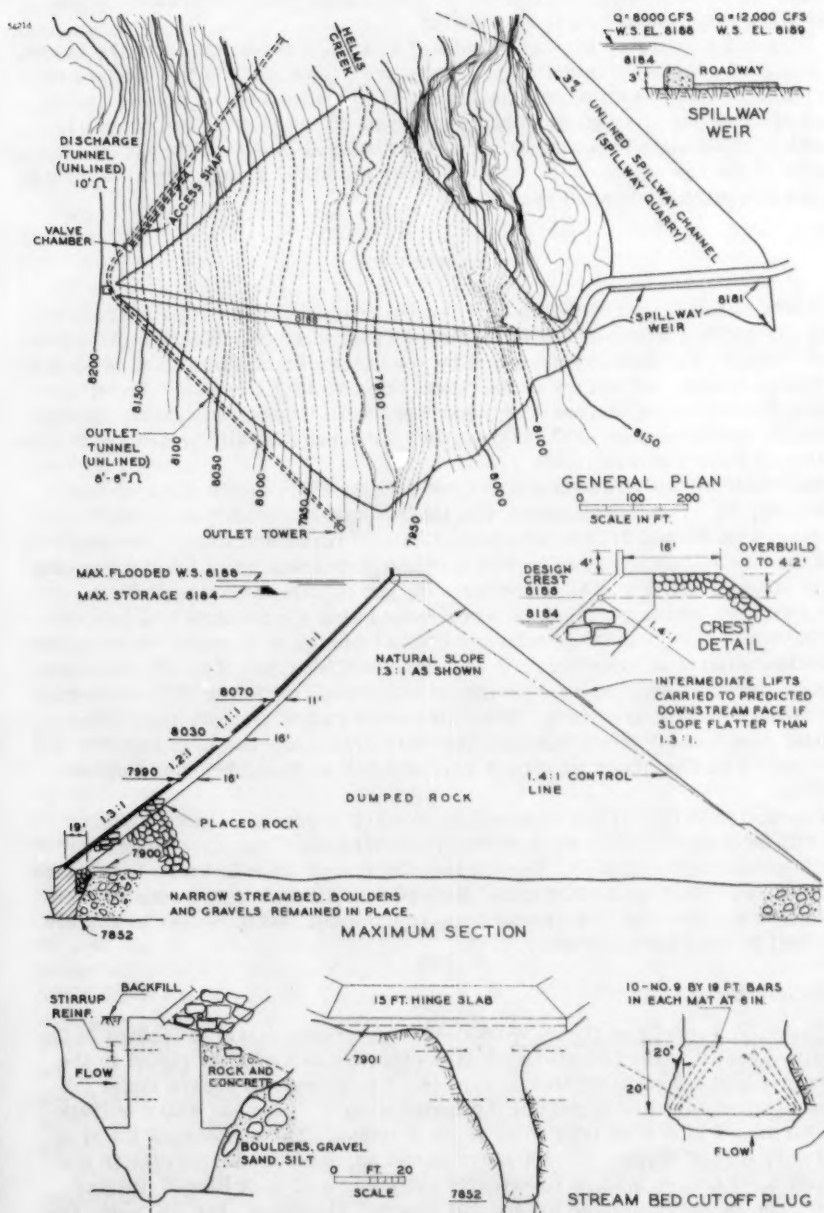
PLAN-SECTION-CUTOFF PLUG-COURTRIGHT DAM
